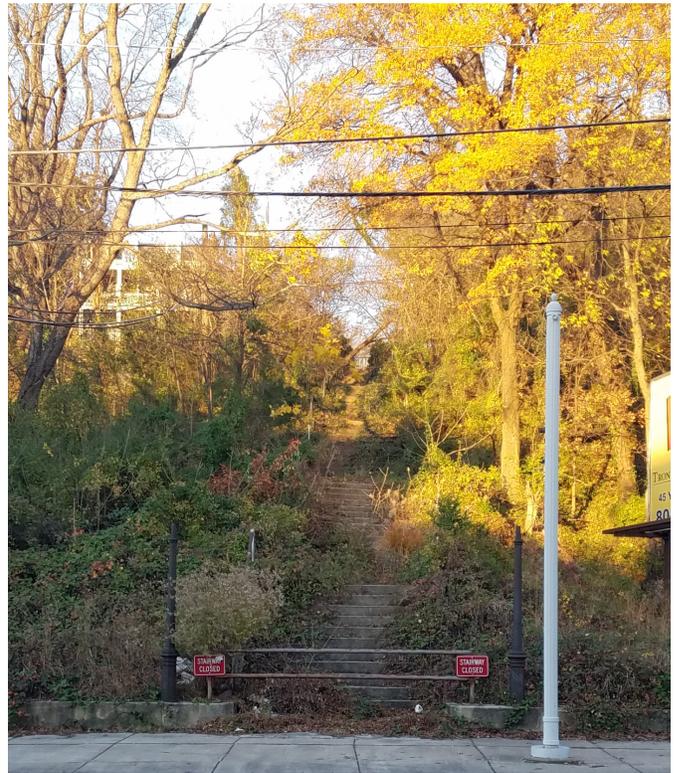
Existing staircase in disrepair which could provide an additional connection between the neighborhood of Church Hill and the BRT corridor
